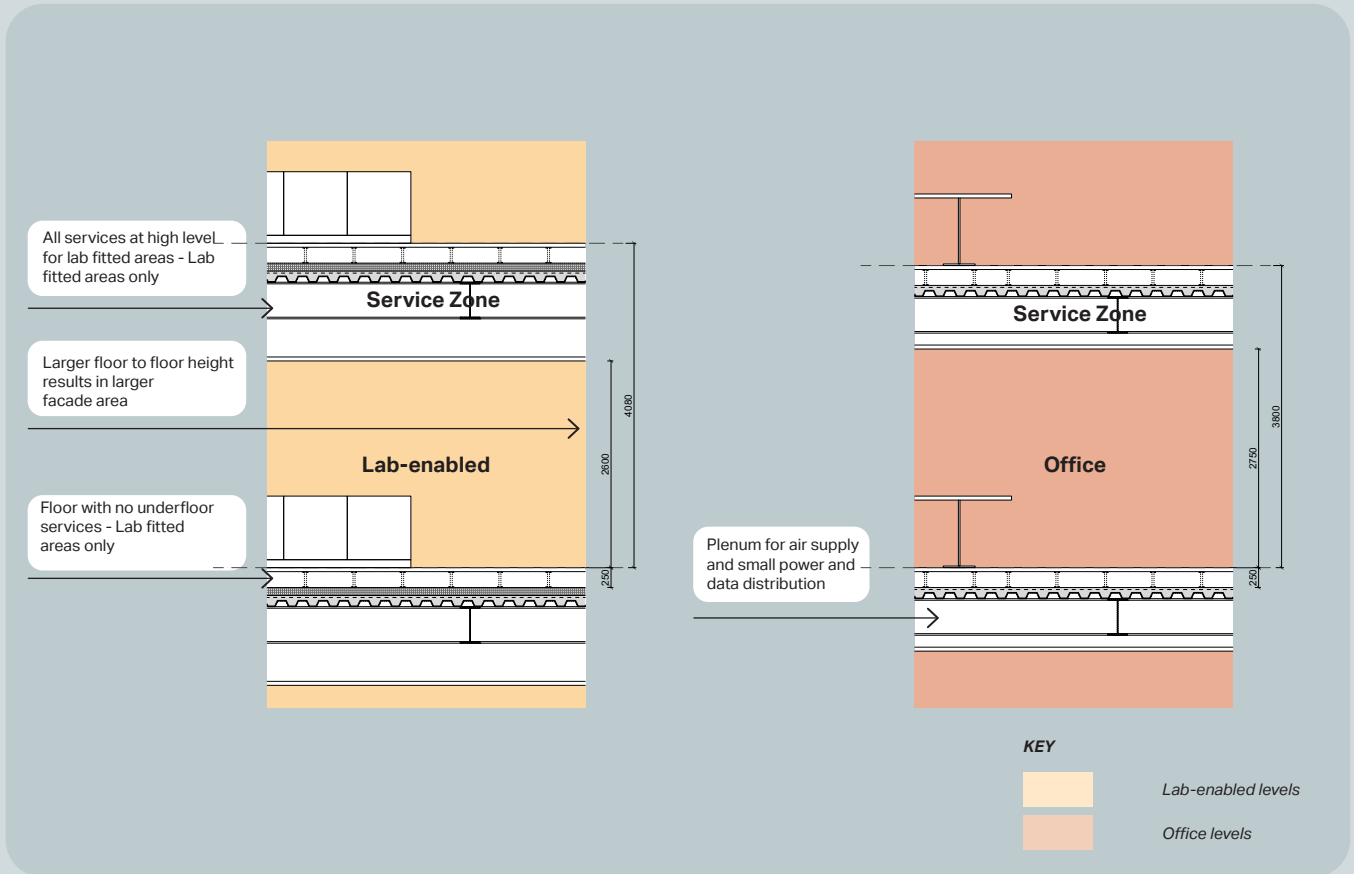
Indicative sections comparing floor to floor heights for lab-enabled and office levels
